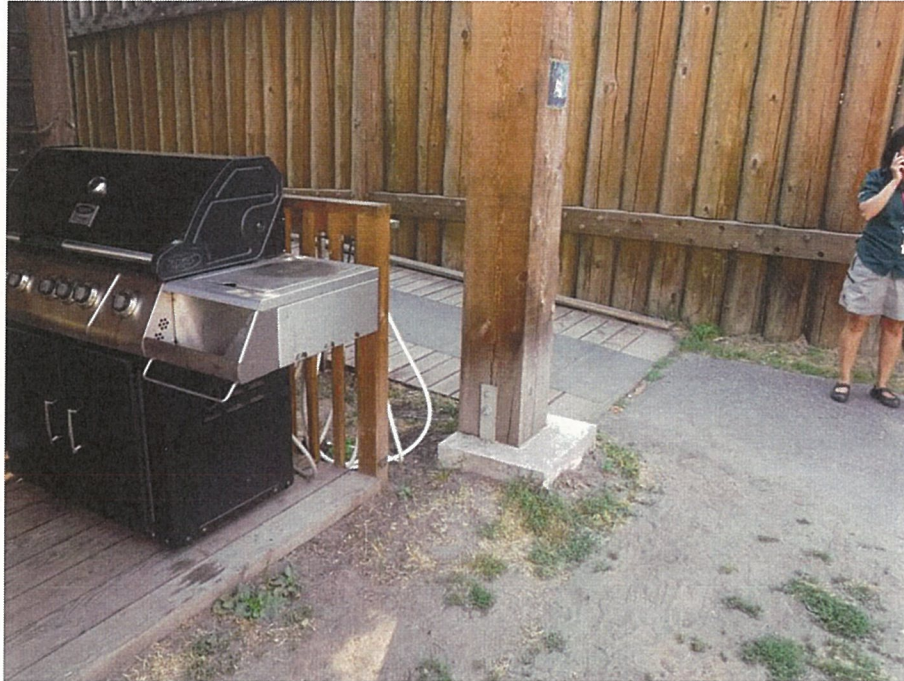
Log Palisade and Timber Deck in adjacent east to Building
